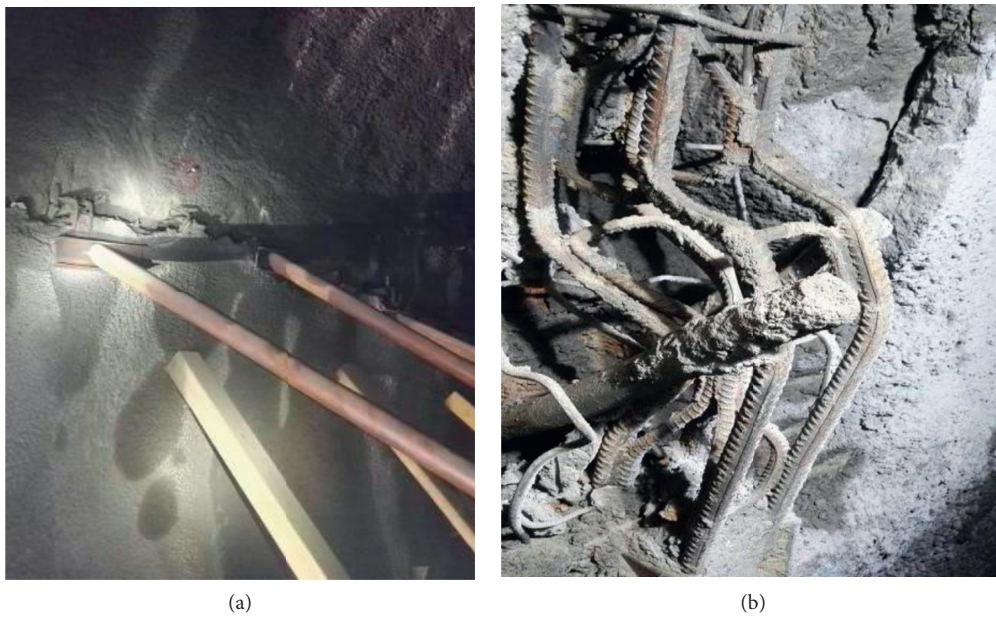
Damage of primary lining in the deep-buried loess tunnel. (a) Concrete cracking. (b) Steel frame twisted.
